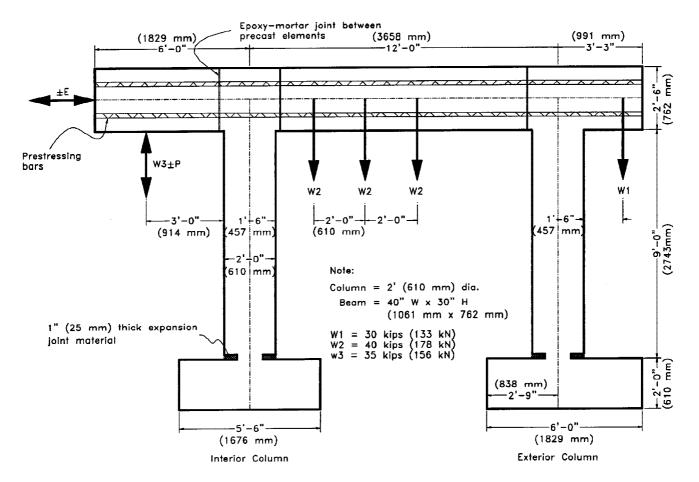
Overall dimensions and test set-up of Multi-Column bridge bent test.
